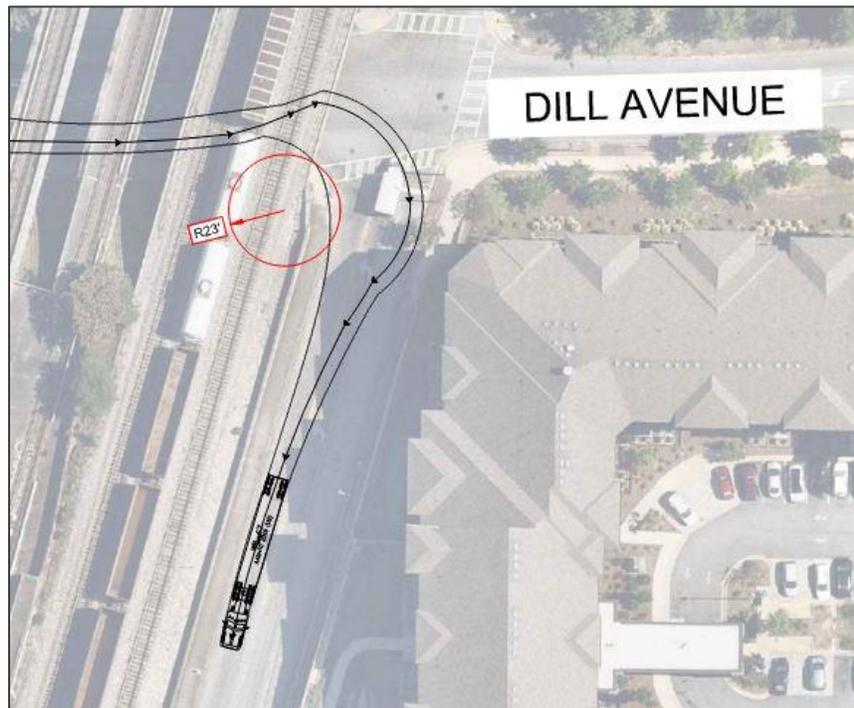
Dill Avenue at Murphy Avenue – Eastbound Right (Entering Truck)
